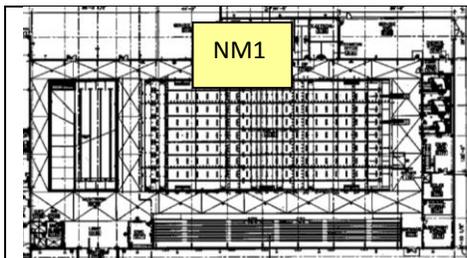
Natatorium 1st Floor Mechanical Room Location
